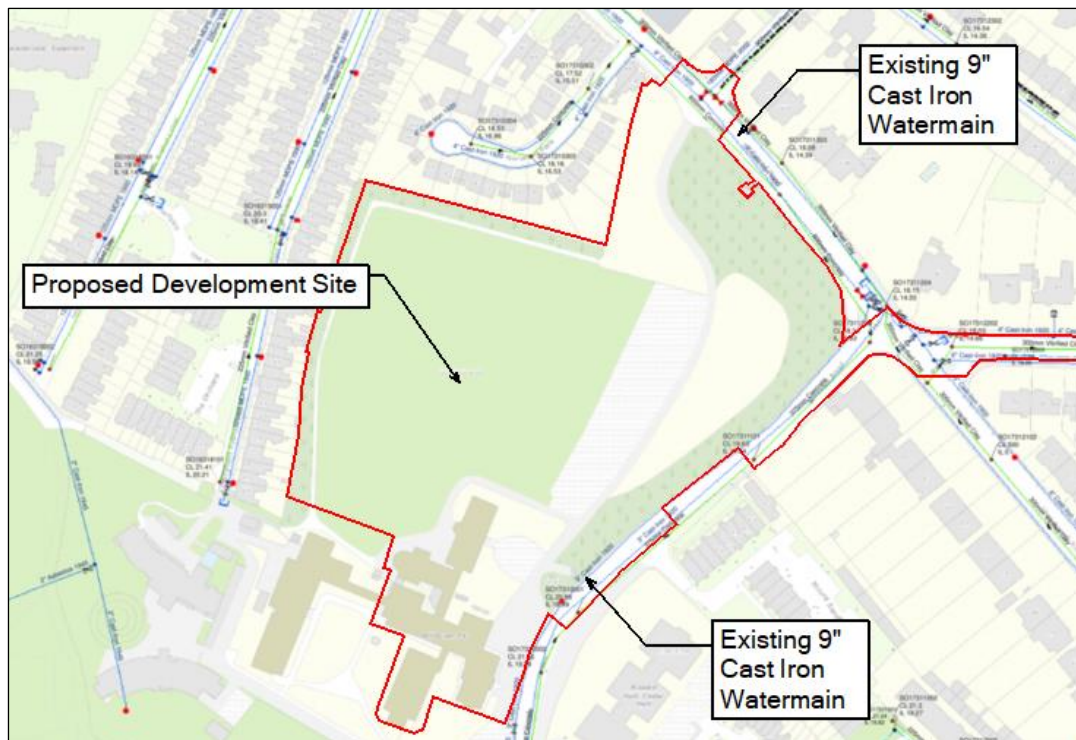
Extract from Irish Water Network Plan (Site Boundary Indicative)
